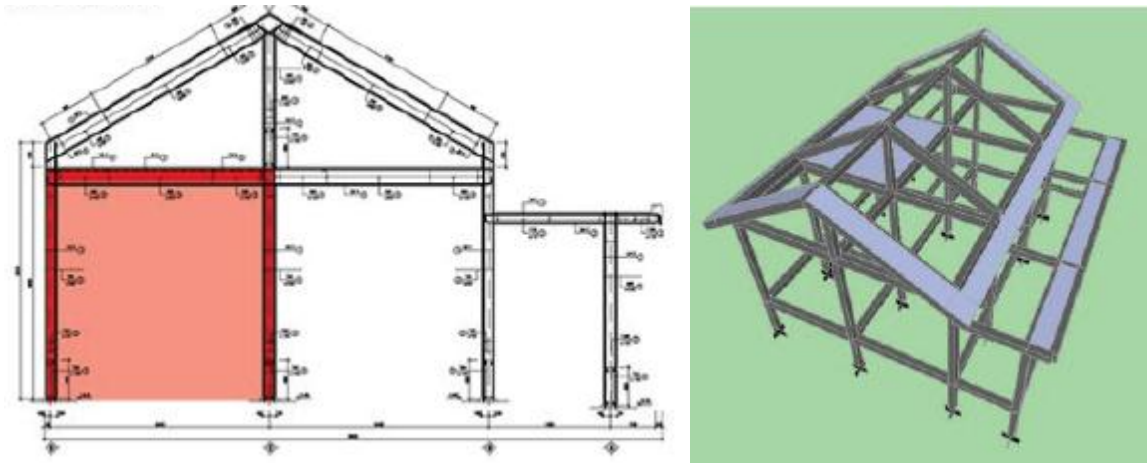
Building technology: Safe failure or solid room and all parts of the building securely connecte (Source: ISET, 2013)
